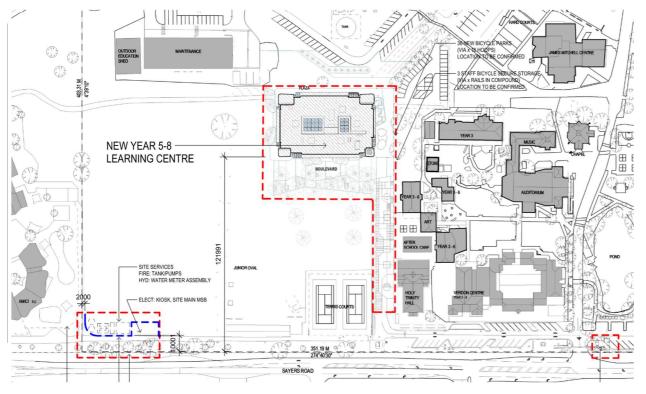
Site Location Plan(from Baldasso Cortese, A-TP101 Rev B)
